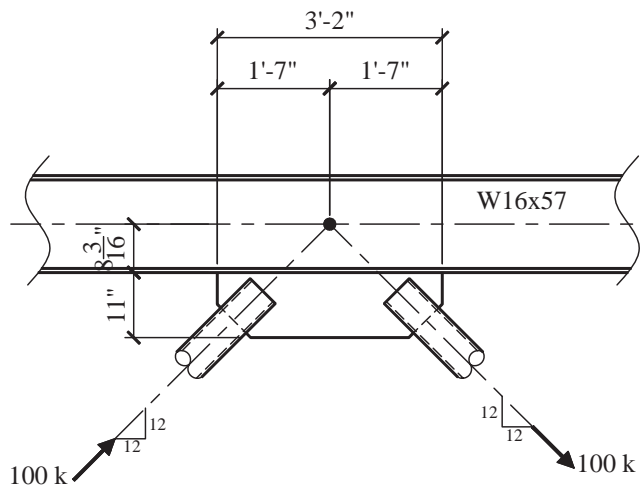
Equal brace bevels and forces in a compression-tension brace arrangement.
